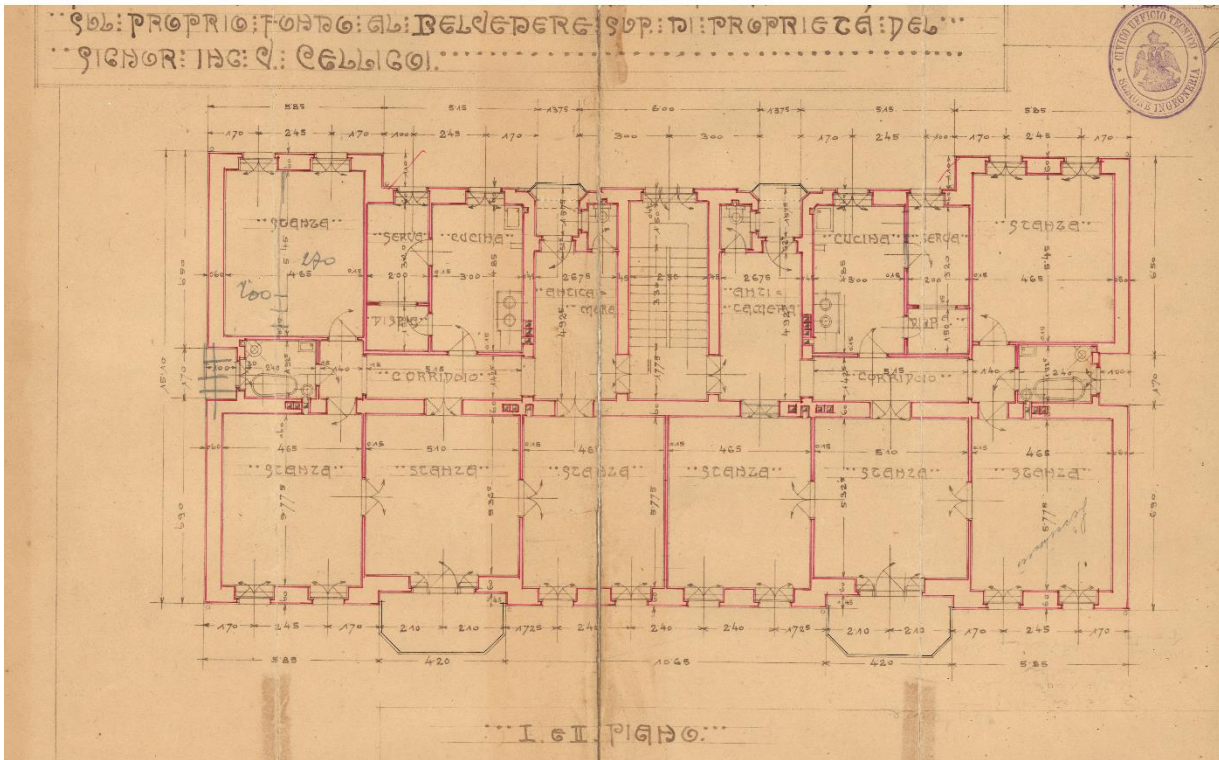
Vjenceslav Celligoi, Eugenio Celligoi, Theodor Träxler: Celligoi residential building, floor plan of the first and the second floor (source: State Archives in Rijeka)
